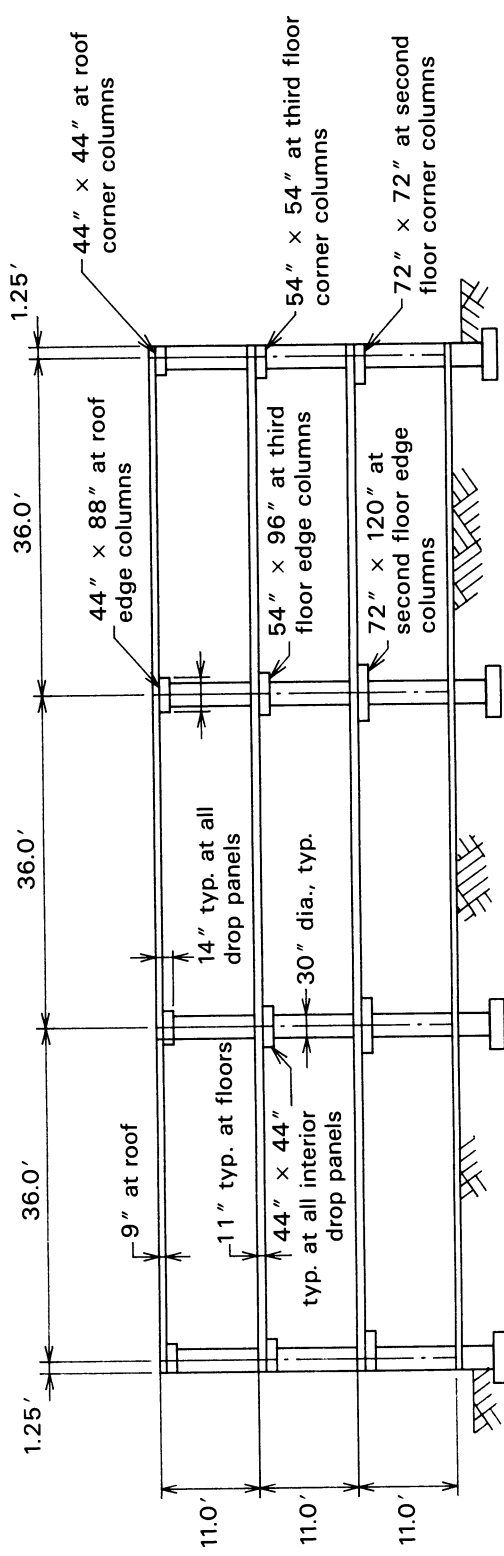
Section through the building analyzed in I.P. 13-2.
